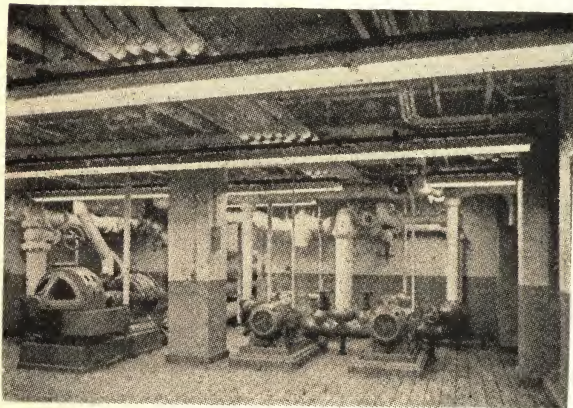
Pump room is approximately 20 x 25 feet with an 11-foot ceiling. Two-lamp, 96T12 reflectors are mounted 8 feet above floor in continuous rows, 8 feet on centers, with standard cool white fluorescent lamps providing 40 footcandles.
